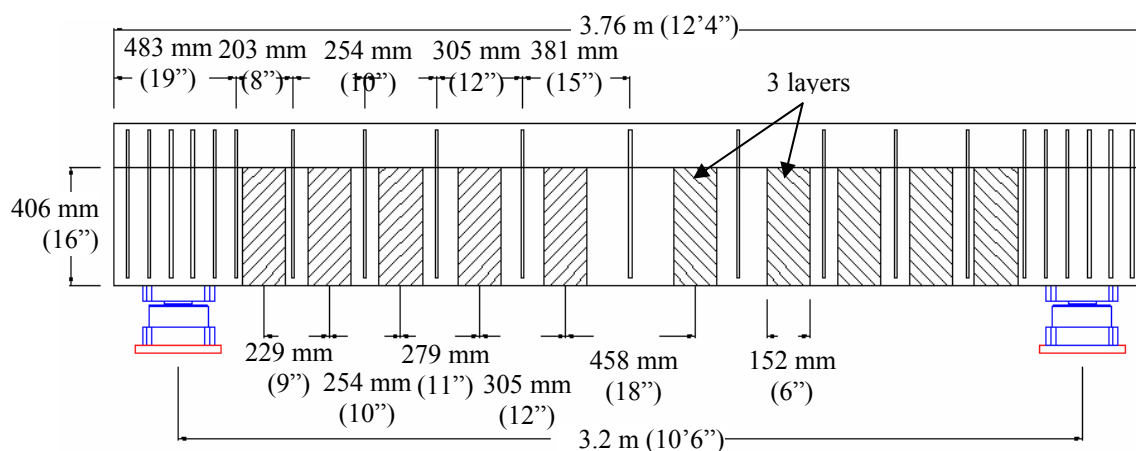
Schematic of shear strengthening of girder with composite stirrups
